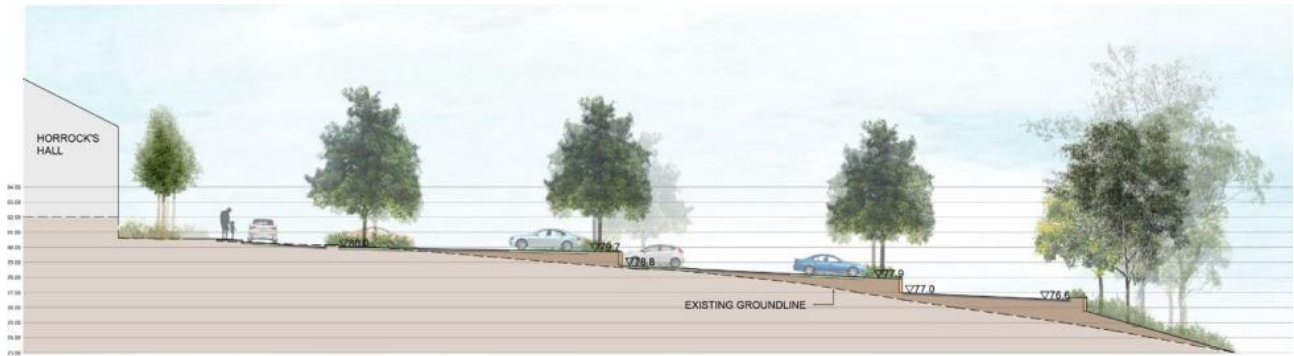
Section of landscape through from the Preparatory School to the new access road and carpark, and showing the southern planted embankment
